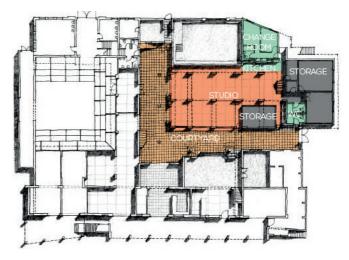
BAT centre spatial ground floor plan, not to scale (Mikula 1994) (Edited by author 2014)
